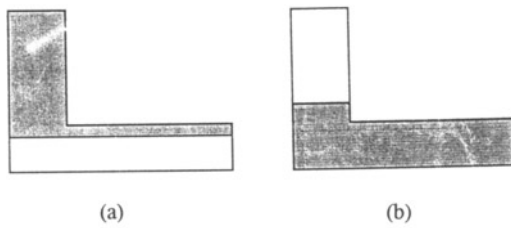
Possible uplift states, L-shaped in plan of foundation
